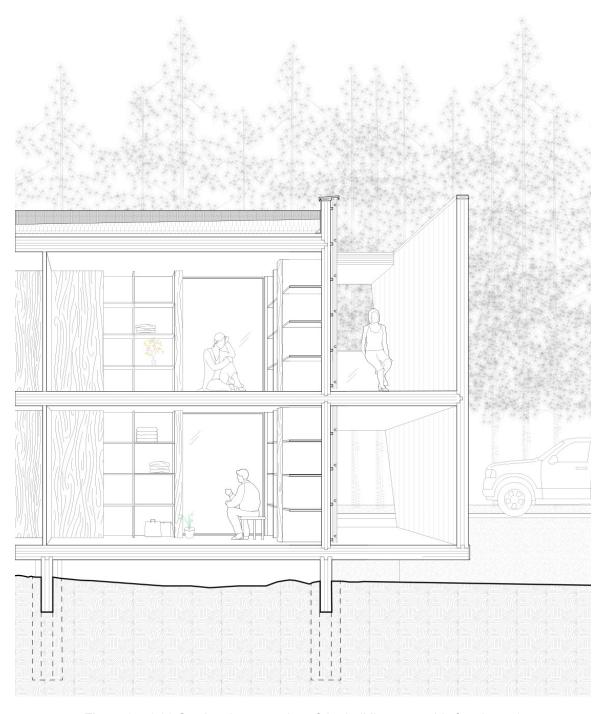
1:30 Sectional perspective of the building assembly for phase 1
